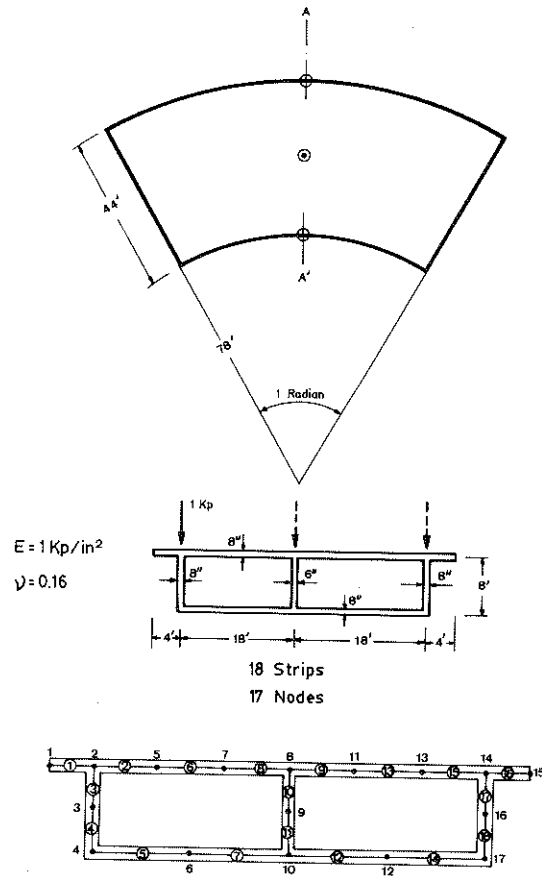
Curved box girder bridge. Geometry of the structure and finite strip idealisation into 18 strips.
